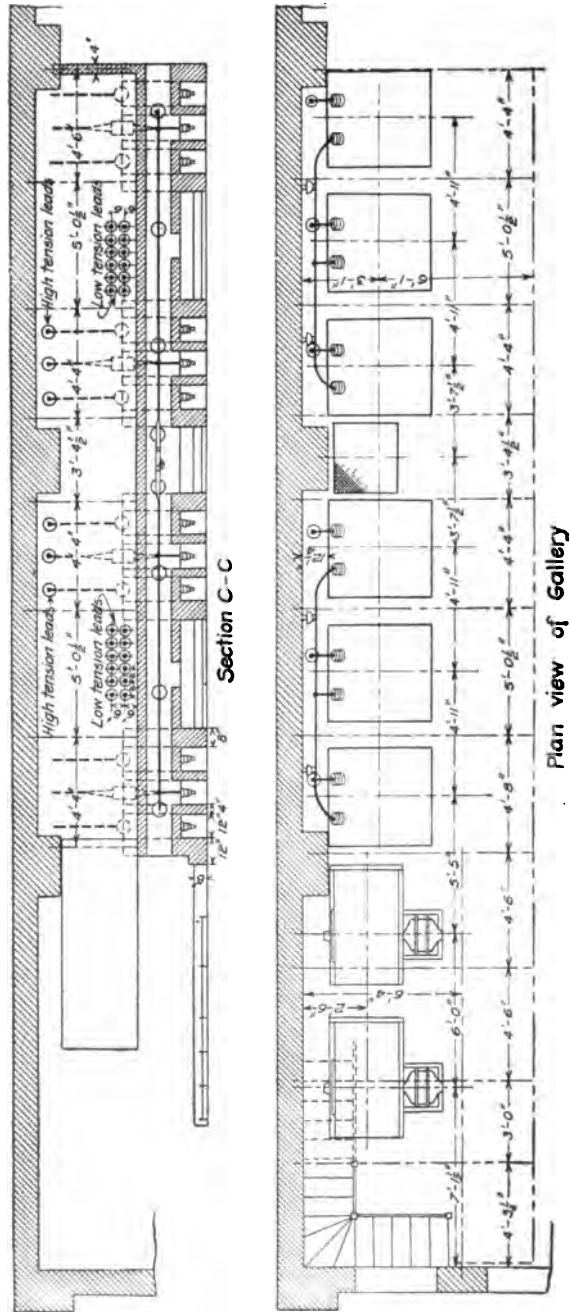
Plan of Bus Structure and of Gallery Floor of De Kalb Ave. Substation.
